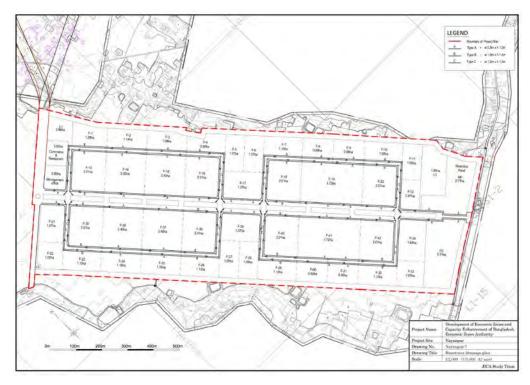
(4)-6 Nayanpur rainwater drainage plan
